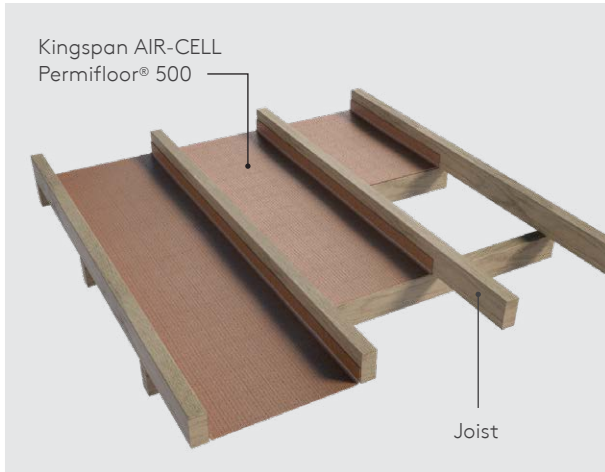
Pre-cut Kingspan AIR-CELL Permifloor® 500 installed between floor joists.
